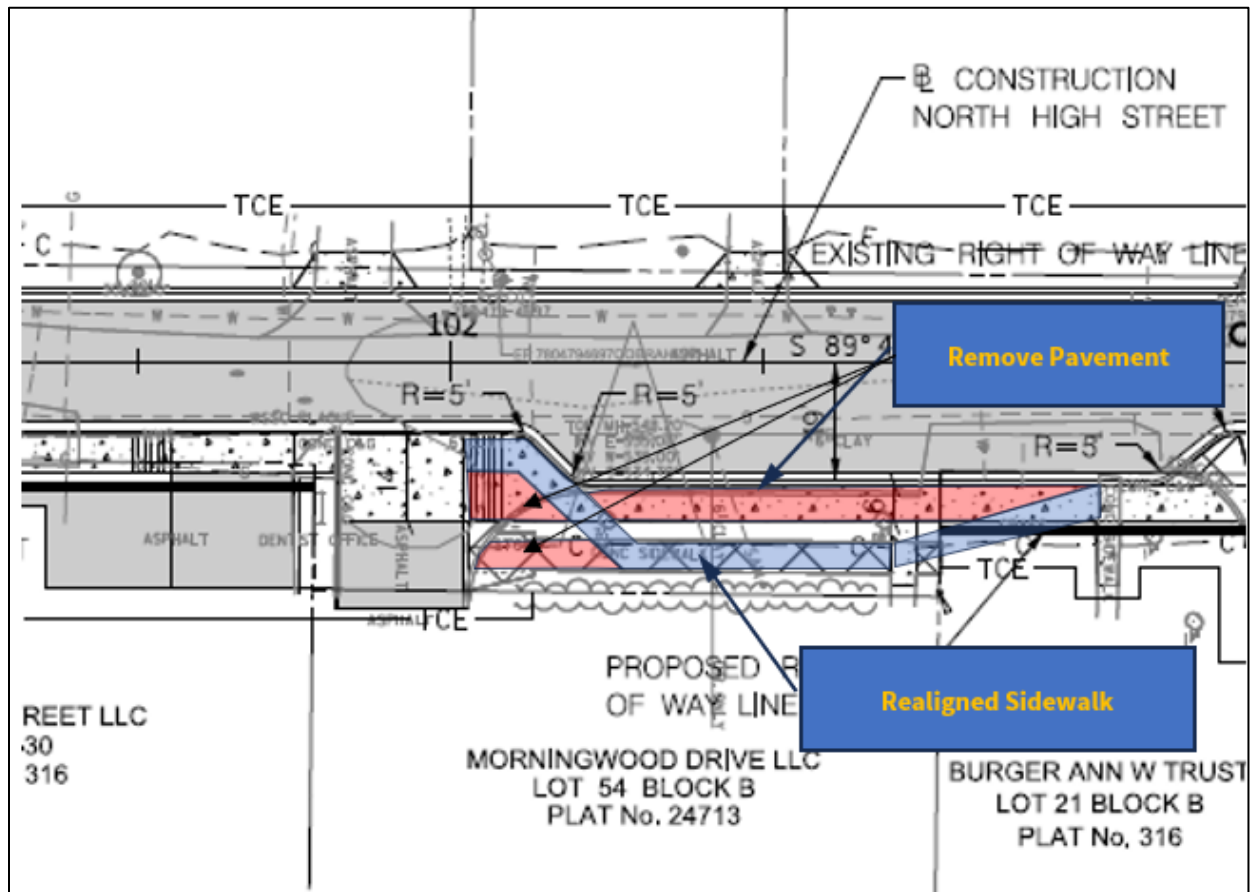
Sidewalk Shift with Goddard School Sidewalk Retained
